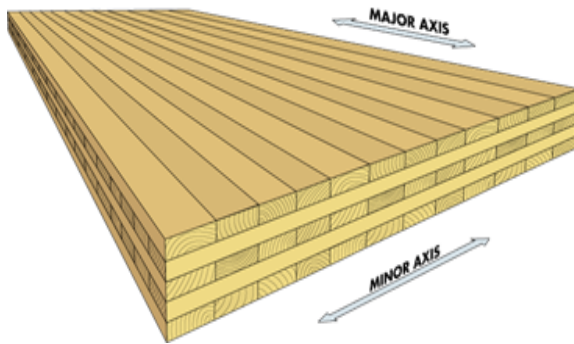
Cross-Laminated Timber (CLT) Panel (Breneman, 2016).
